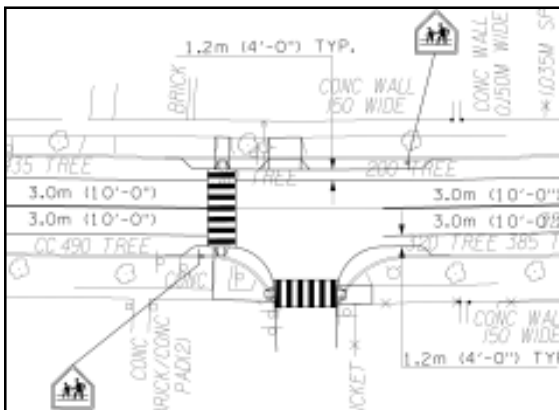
Proposed intersection with Clinton Street.
